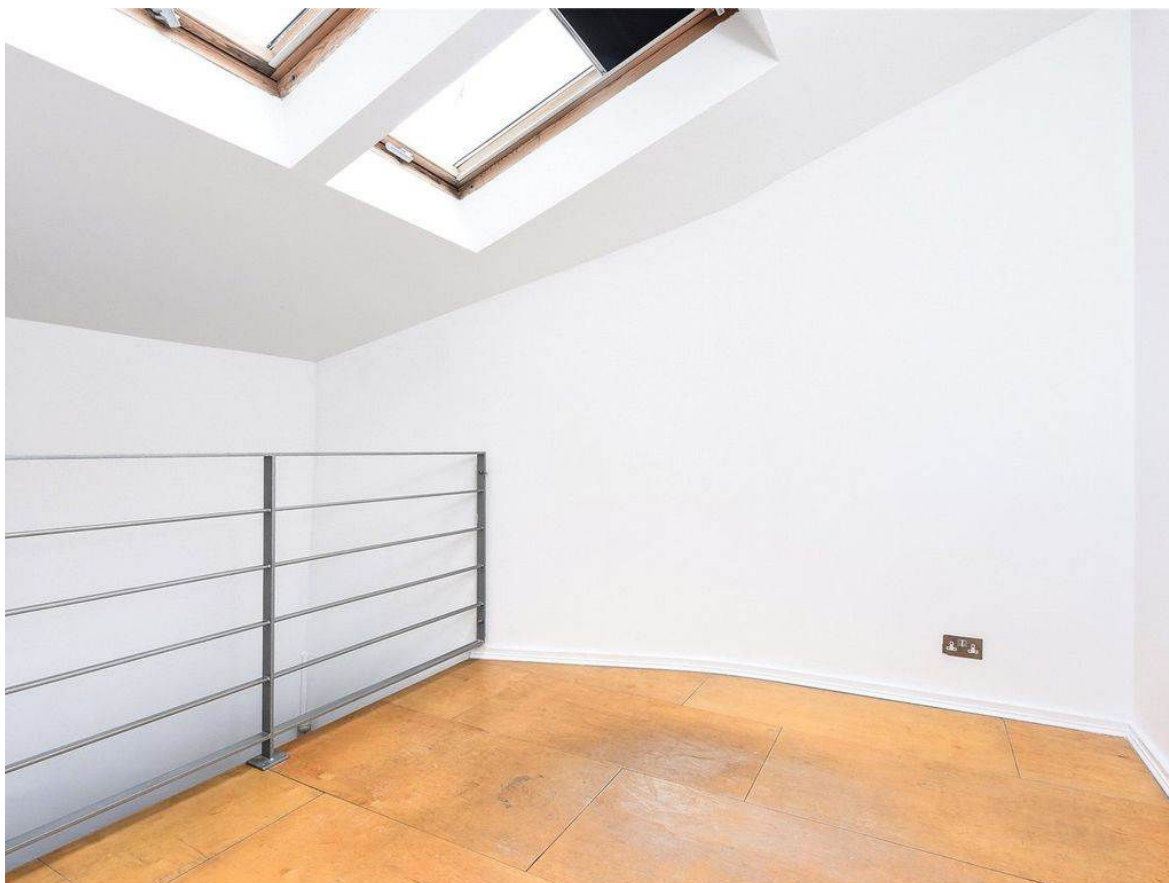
A metal balustrade protects those on first floor from the opening in the floor slab which overlooks the reception area at ground floor level
